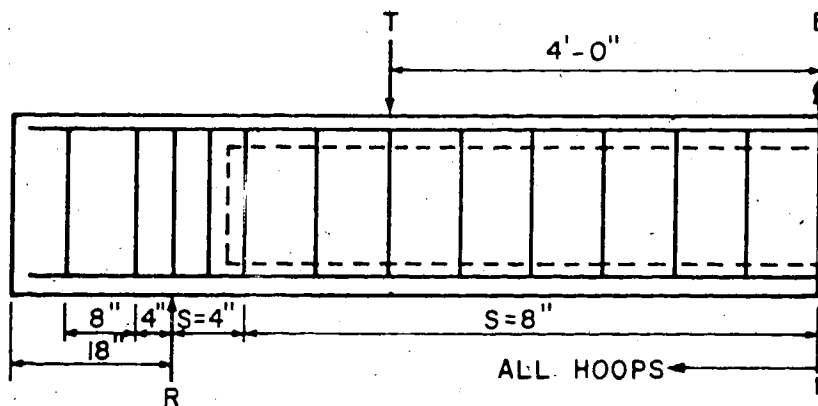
(B) REINFORCEMENT FOR BEAMS R3, R4, R5
